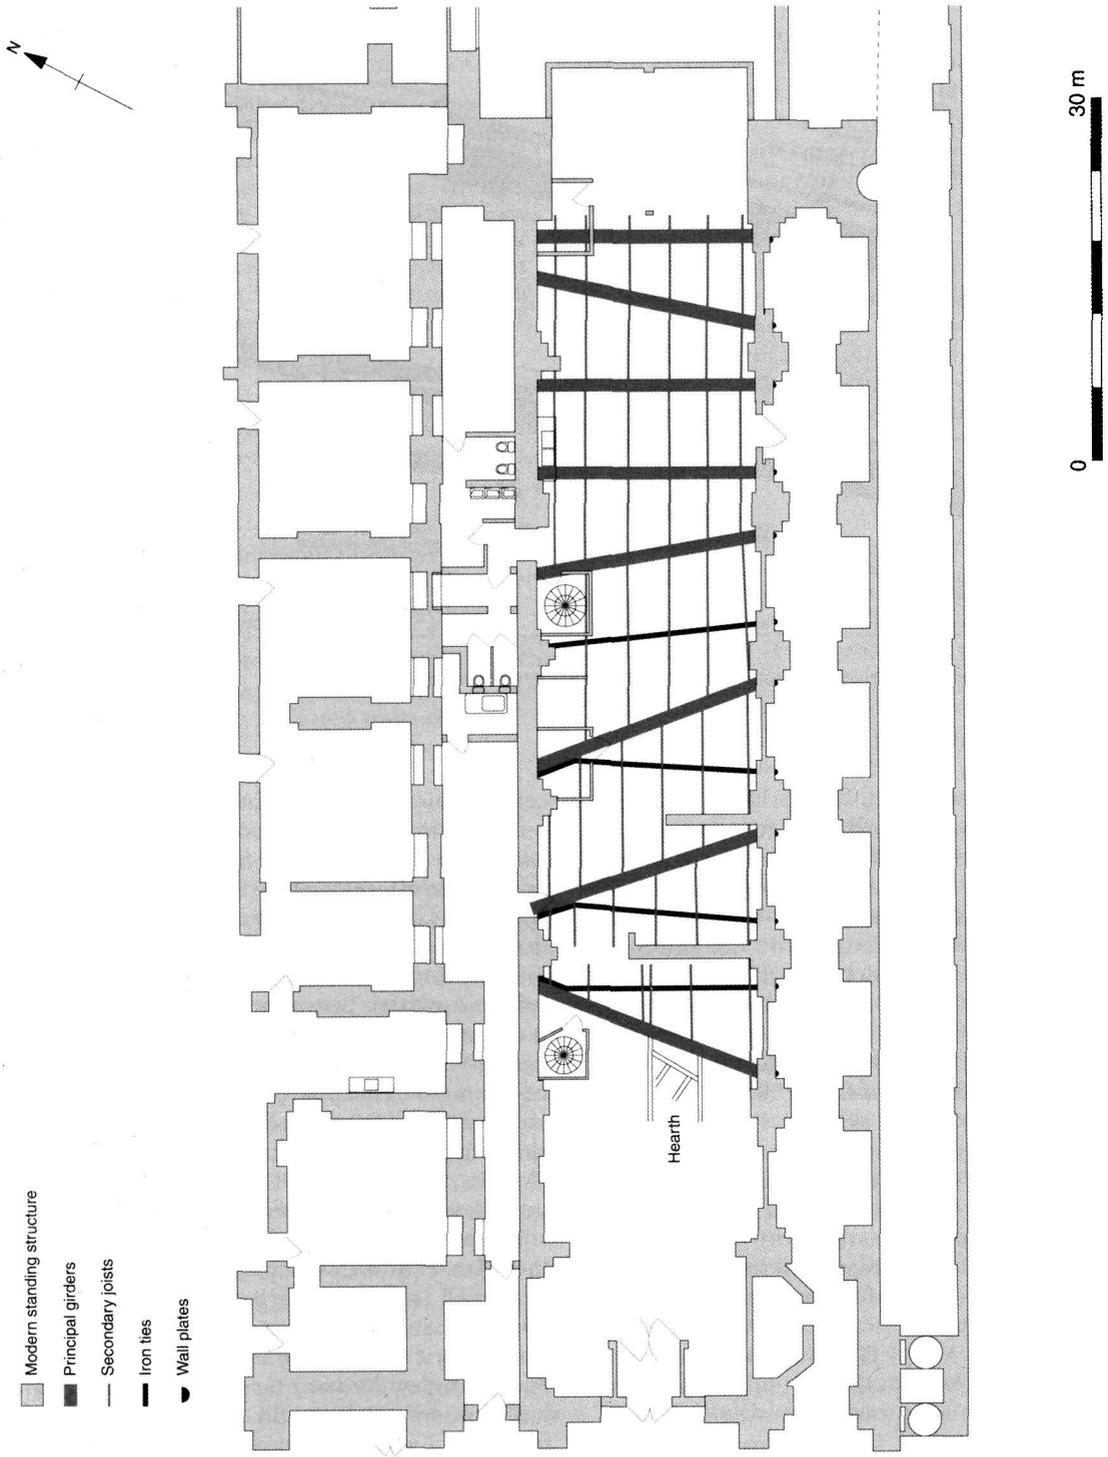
Structural features of the trussed mezzanine floor, and site of former hearth
